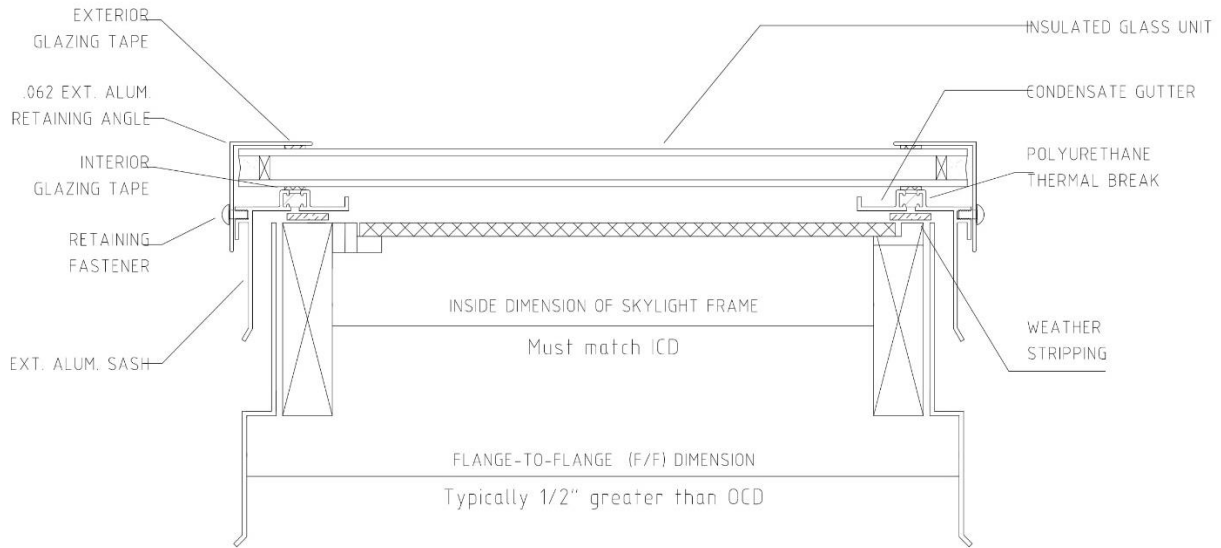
Fixed Glazing Skylight Roof Detail
